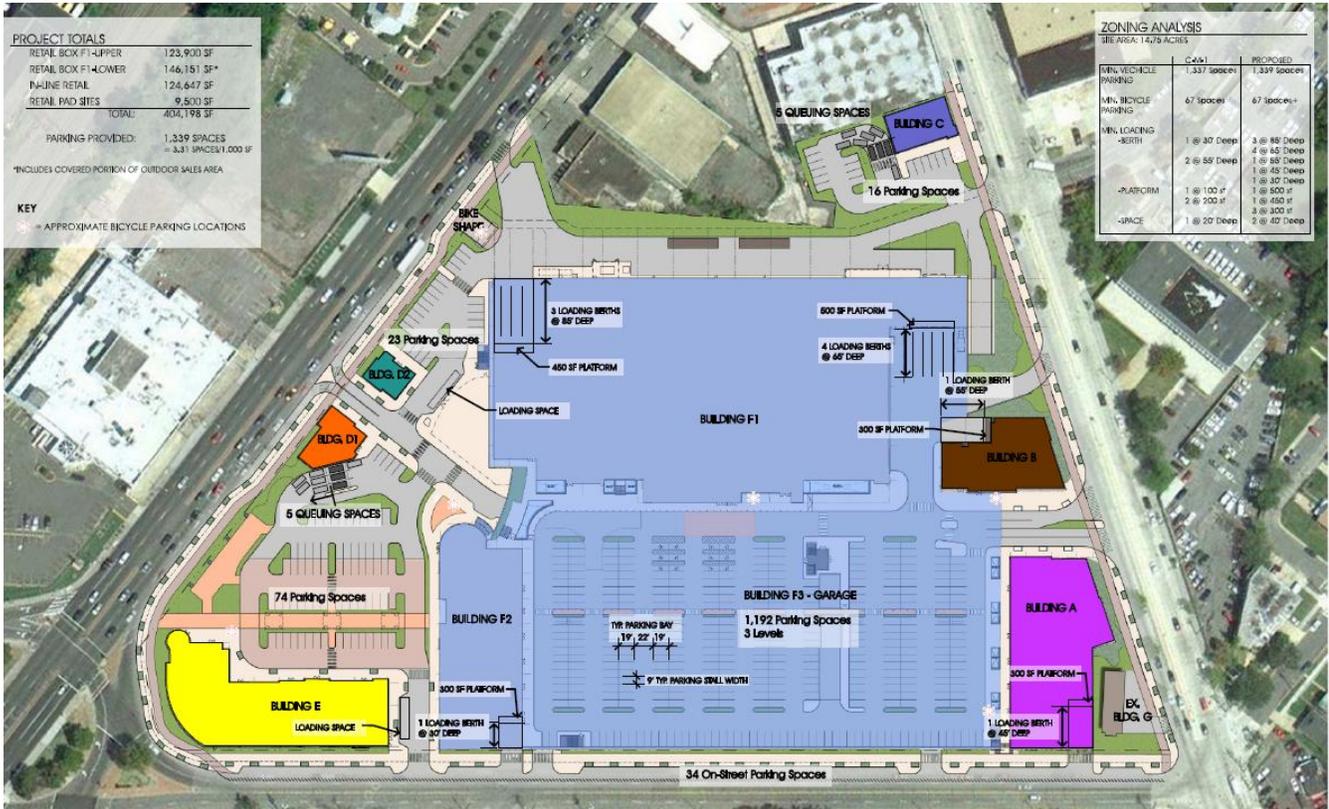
Site Plan at Top Level for Previously Reviewed Project
